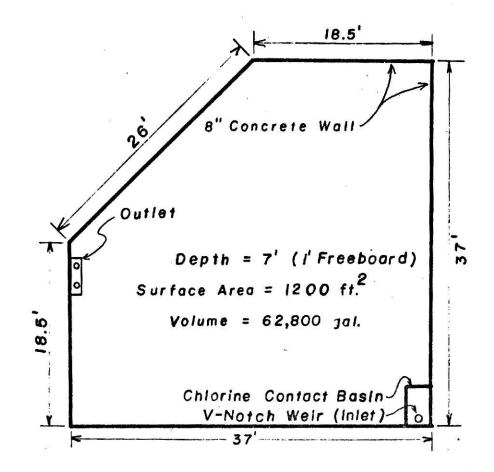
FIGURE I. PLAN OF TIMBER CREEK POLISHING POND
